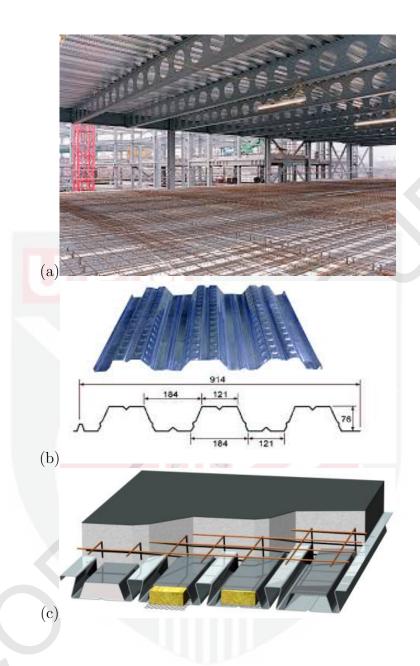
Typical profiled deck slab (a) Profiled deck composite slab construction (b) Embossing (c) Modelled profiled deck slab
